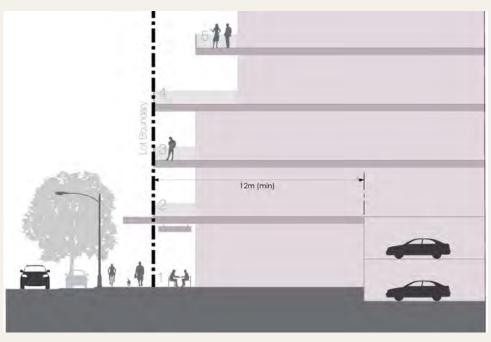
MIXED USE R-AC0 AND RESIDENTIAL 2 R-AC0 PARKING - MULTI-STOREY CAR PARKS SLEEVED BEHIND BUILT FORM
